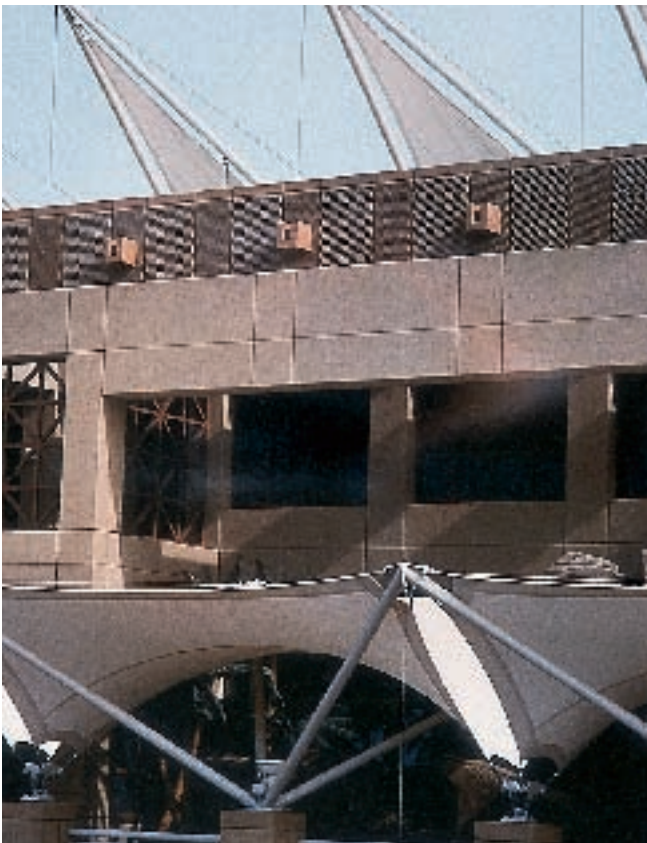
Architectural precast panels in two colors featuring a herringbone pattern alternating on the façade, contrasted with panels that were lightly sandblasted.
